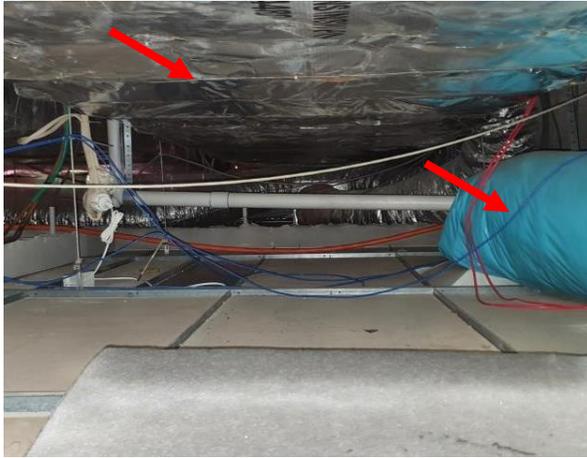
Level 1 Kitchen, ceiling space – ducting assumed to contain SMF
